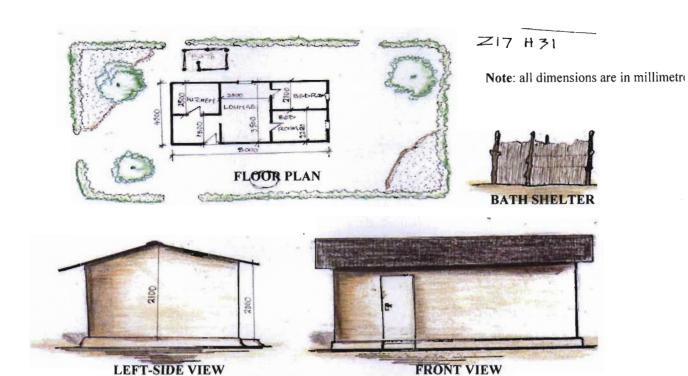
Sketch plan, left side, front views and bath shelter of House No. Z17-31, Kamatipa, Kitwe (source: author 2005).
